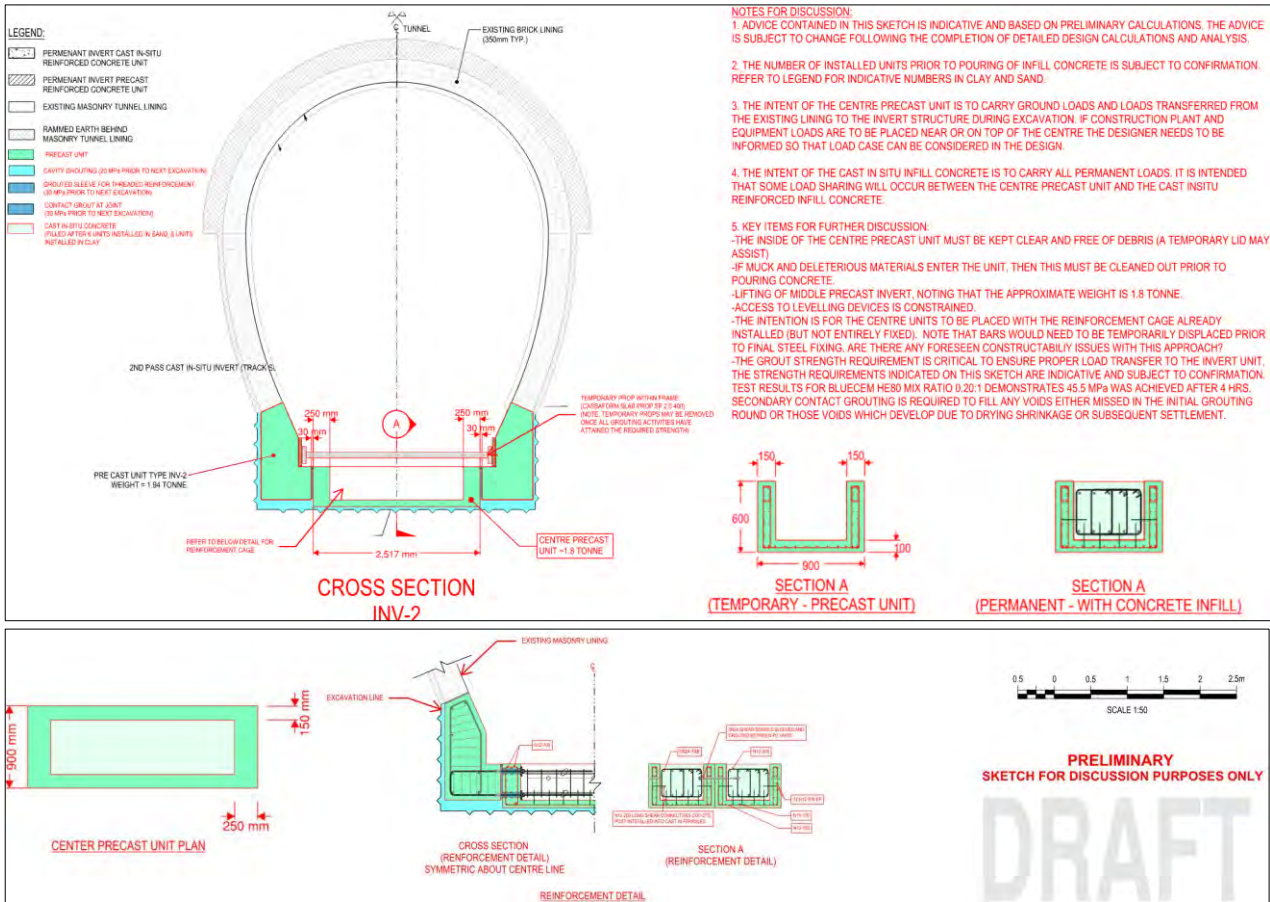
SECTION OF THE TUNNEL AND DETAILS SHOWING THE CENTRAL AND SIDE WALL PRE-CAST UNITS AS SUPPORT TYPE INV-2 IN CLAY AND SAND AREAS OF THE TUNNEL. (SOURCE: AURECON/VLINE)
